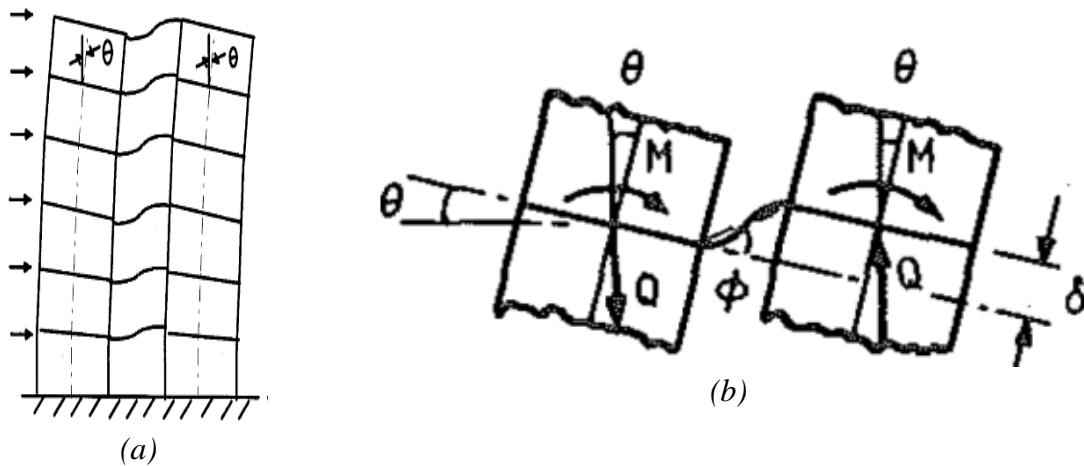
(a) Building forced under lateral load (b) Structural action due to shear forces
